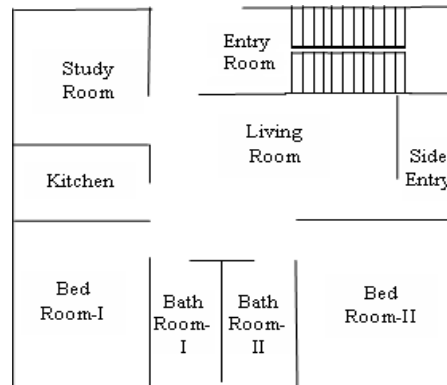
Floor plan of the east-west oriented residential building taken for study (not to scale)
